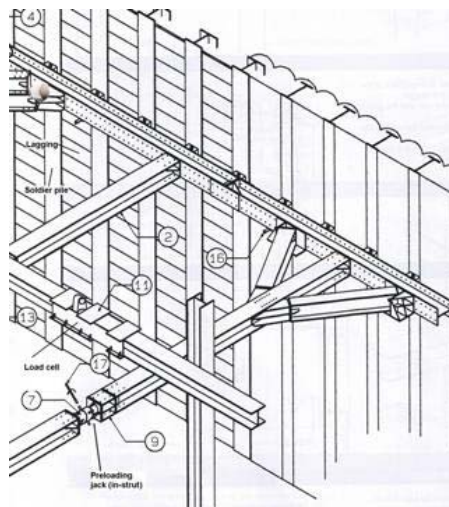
Preloading jack (in-strut), strut load cell (Hirose, c.1996).
